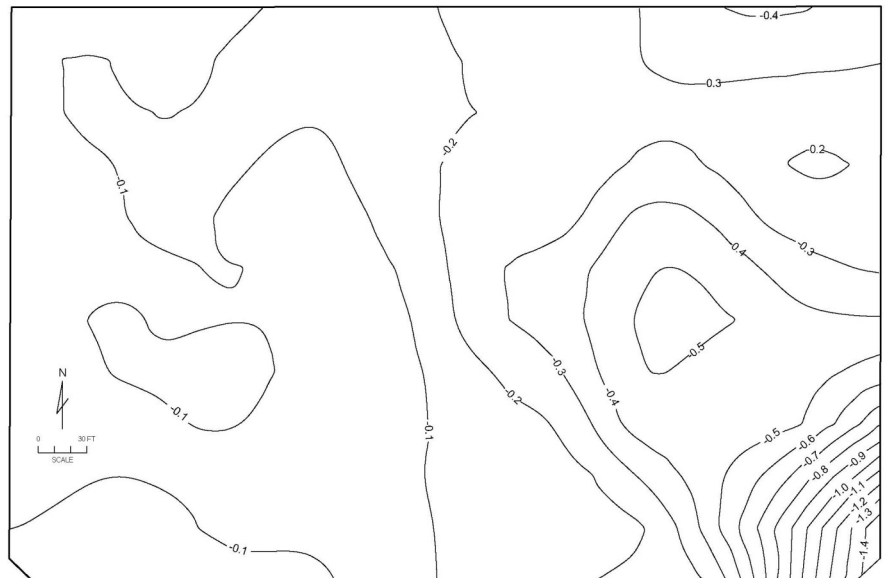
BUILDING SETTLEMENT CONTOURS STRUCTURE
